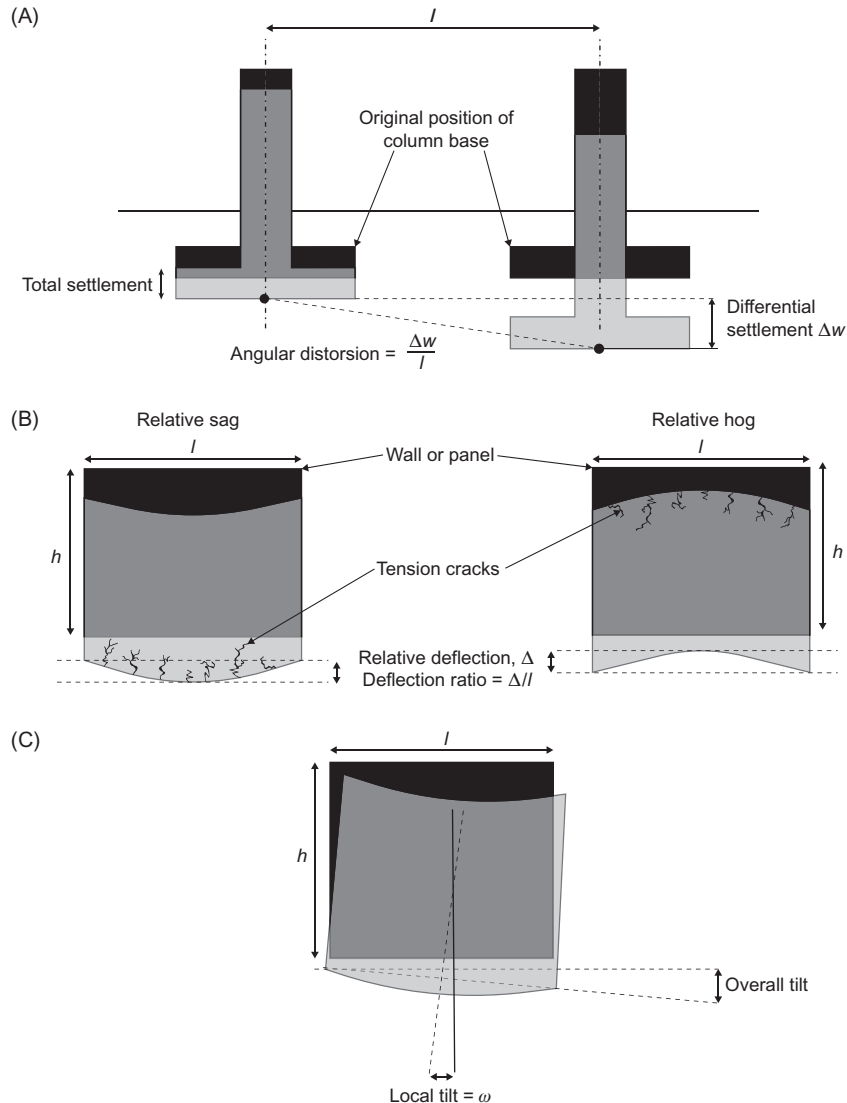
Definitions of (A) angular distortion, (B) deflection and (C) tilt for framed and wall structures. Modified after Wroth, C., Burland, J., 1974. *Settlement of buildings and associated damage*. In: SOA Review, Conf. Settlement of Structures, Cambridge, pp. 651–654 and Poulos, H.G., Carter, J.P., Small, J.C., 2002. *Foundations and retaining structures – research and practice*. In: *International Conference on Soil Mechanics and Geotechnical Engineering*, vol. 4, Balkema, pp. 2527–2606.
